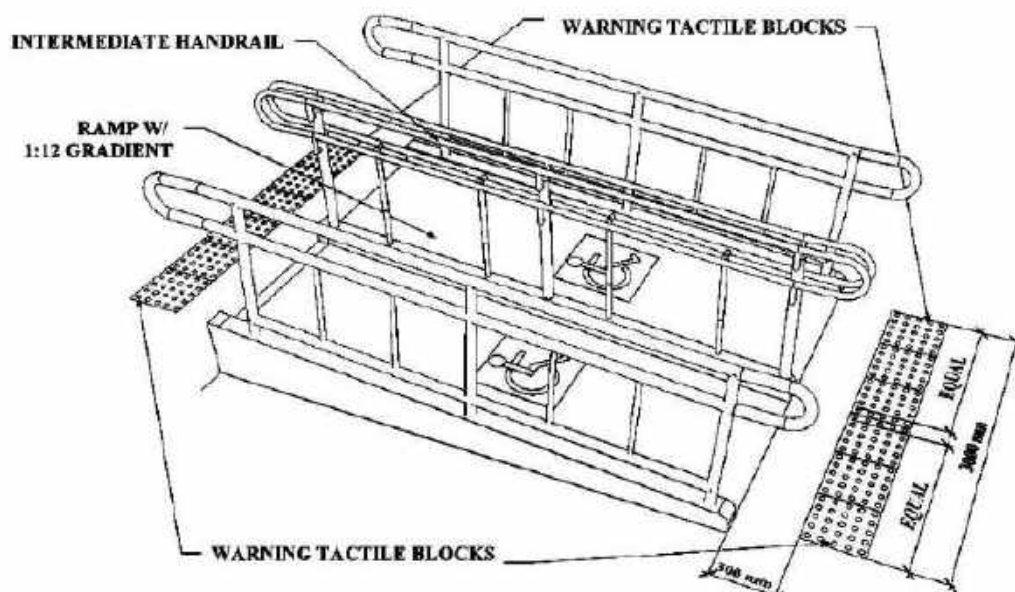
Image above shows a 3D view of an accessible ramp more than 3.00M. wide and complete with handrails (including intermediate handrails) and continuous curbs on both sides and the middle, signage, and Warning Tactile Blocks
